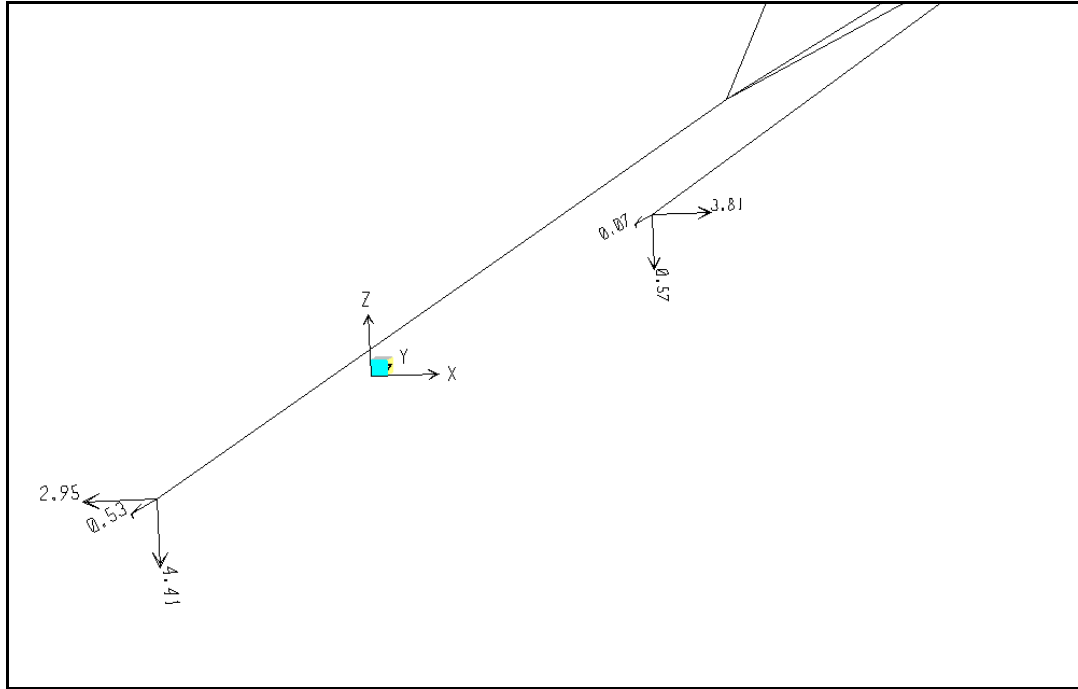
Joint reactions at the start of bridge span for WIND2 load case.
